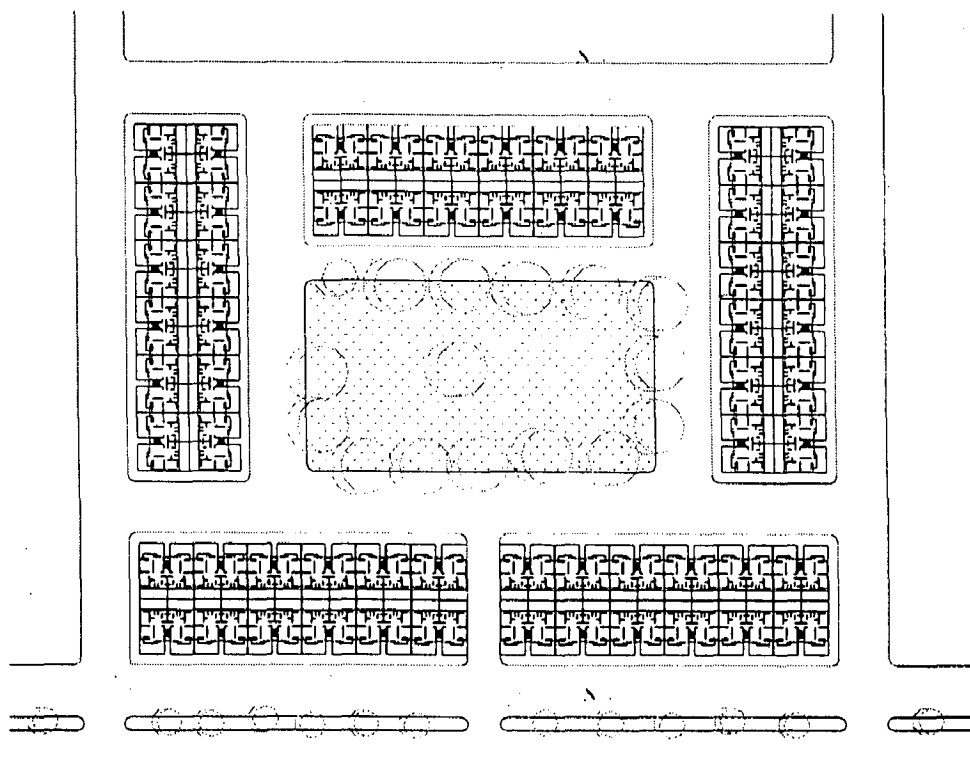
Pocket plan – sector 16 B (Vasundhara)
